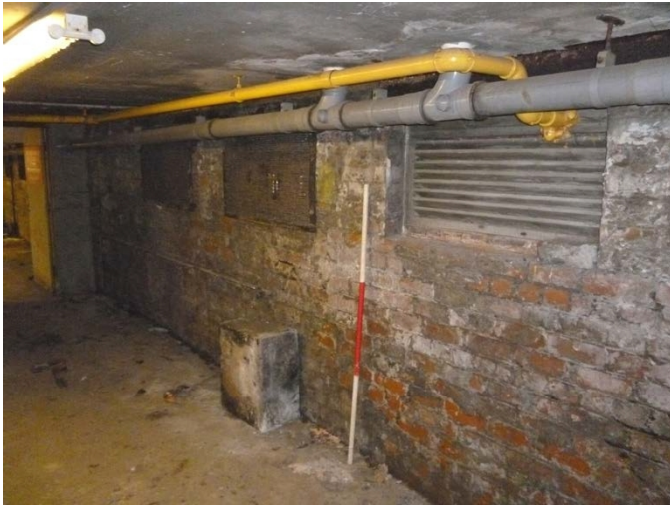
(left): Windows, north-west elevation of the south-west room of the basement
